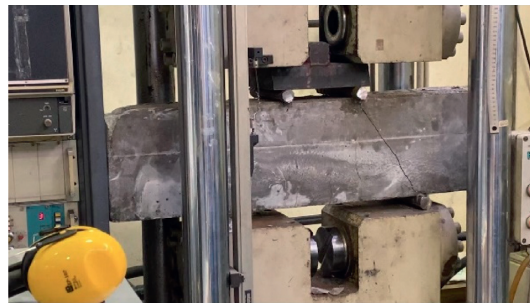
Cracks made in the concrete beam reinforced with the basalt-wire hybrid composite bar.
